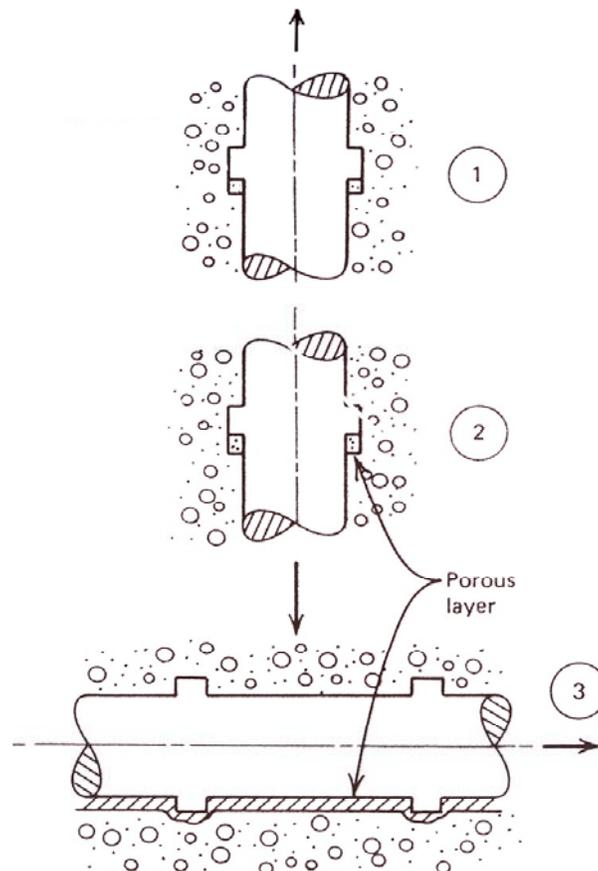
The porous layer under the ribs and the rebar upon concrete placement
